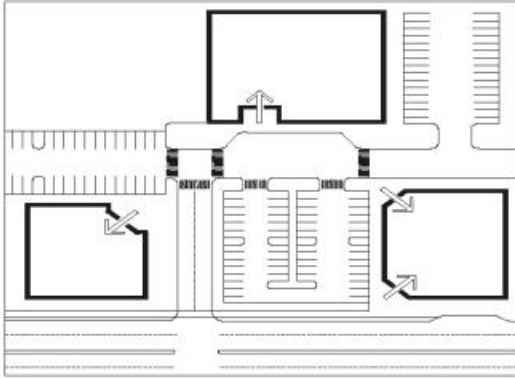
(A): Example showing how shared driveways and consolidated parking lots can reduce parking requirement while also creating more pedestrian friendly environments by reducing curb along streets.
